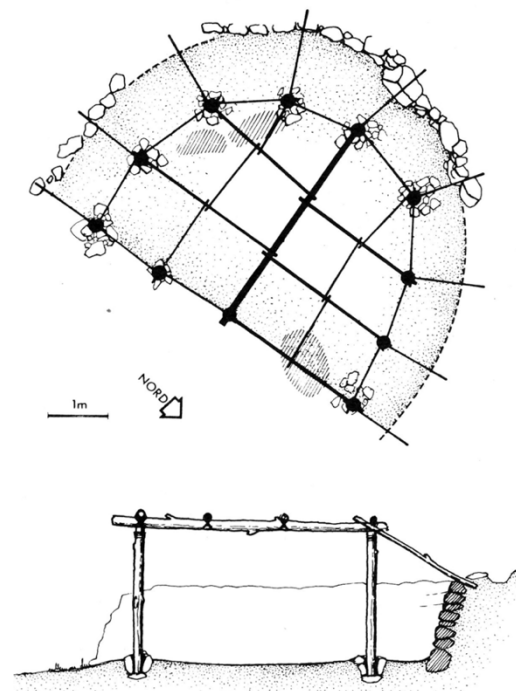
Eynan. Building 131/51 (reconstruction) (Haklay & Gopher, 2015, p. 5).
